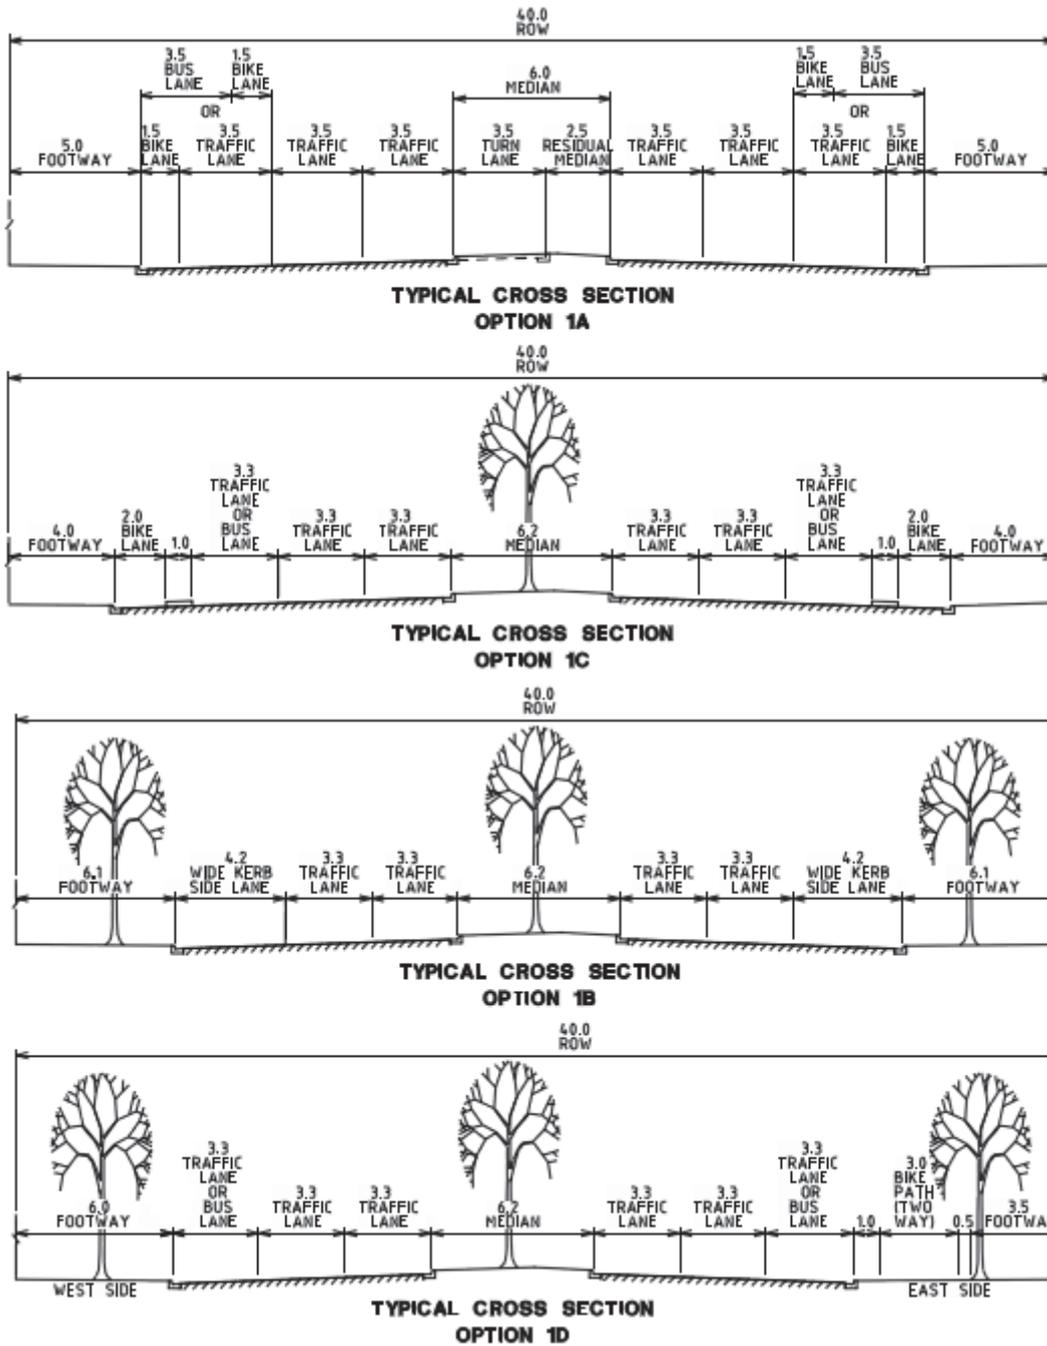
Indicative Cross Sections for Divided Six Lane Road within 40 Metre Road Reserve
